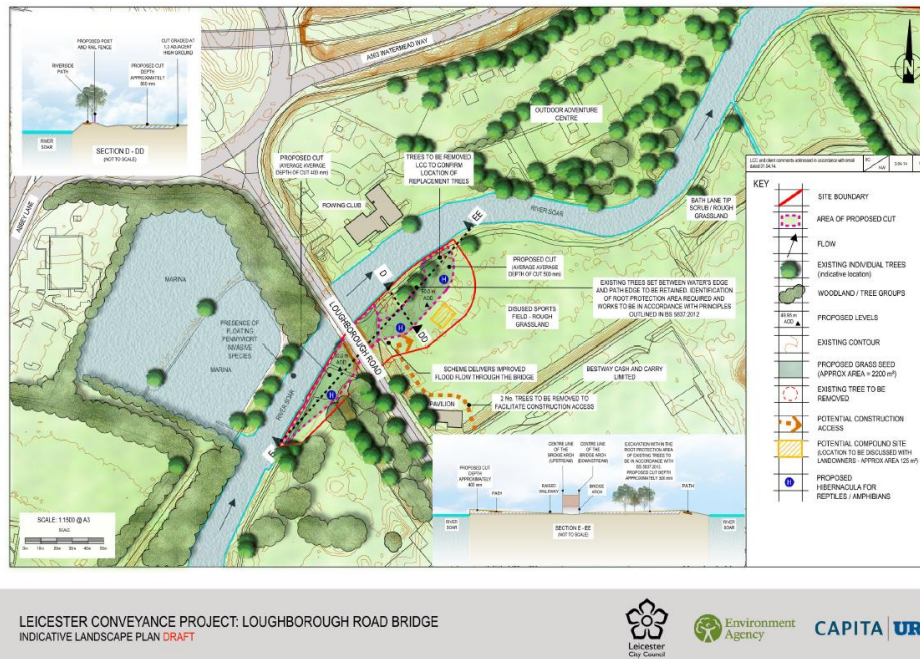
Leicester Conveyance Project: Loughborough Road Bridge (indicative landscape plan).
